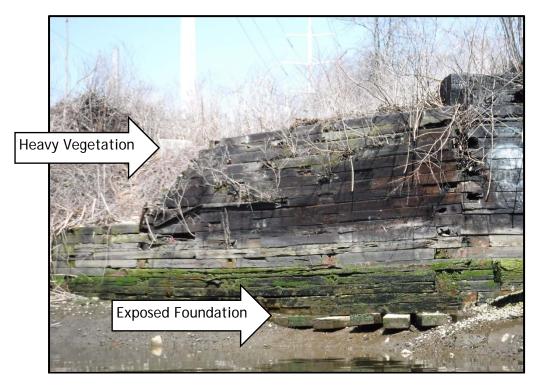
East timber abutment of abandoned rail crossing, looking east, photo taken April 14, 2016.
